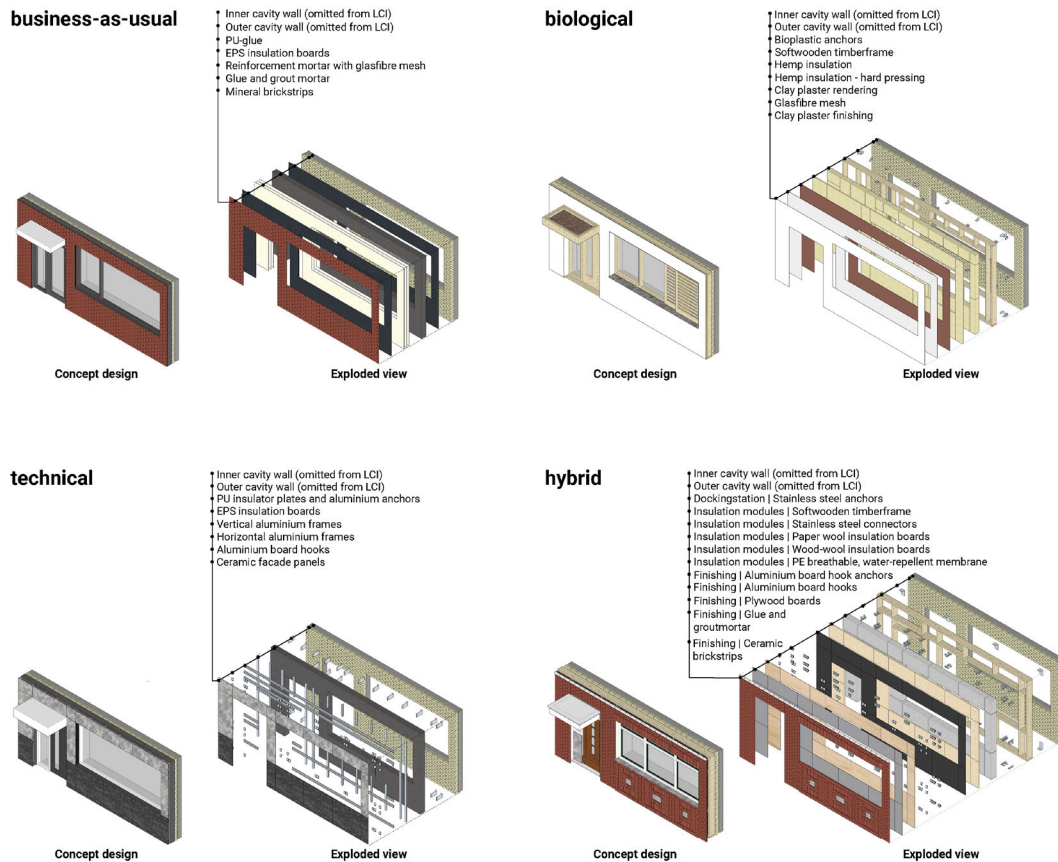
The Circular Skin design variants, including an exploded view.
